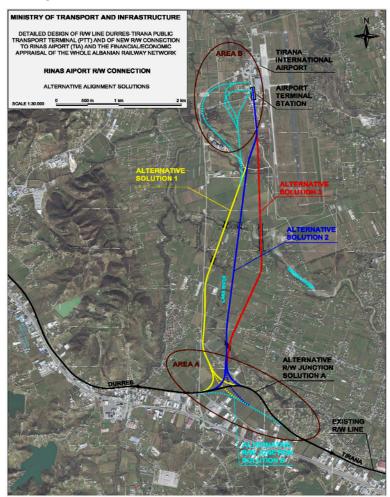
Rinas Airport railway connection alternative alignments. Alternative alignment 2 is the proposed solution
